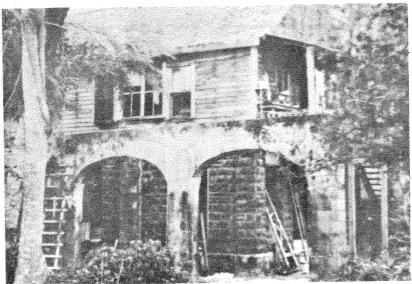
Illustration No. 43. View of the Founder's House, from the southeast, showing the arches after construction in 1908, and the addition of a stair access on the exterior of the east elevation. Photograph circa 1909.
